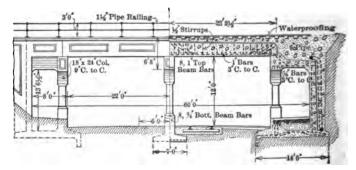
Typical end elevation and cross section, of Carolina Ave. and Florida St. Subways.
